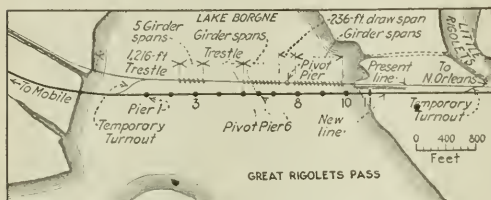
RECONSTRUCTION OF RIGOLETS BRIDGE:
